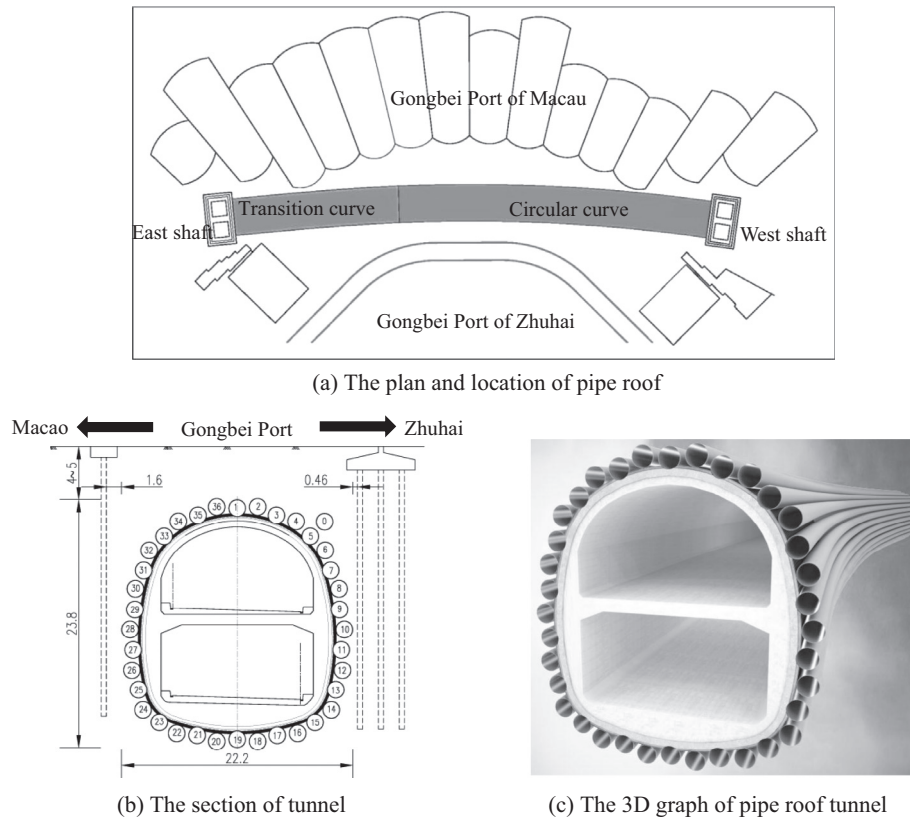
The curved pipe jacking roof of Gongbei tunnel (unit: m).
